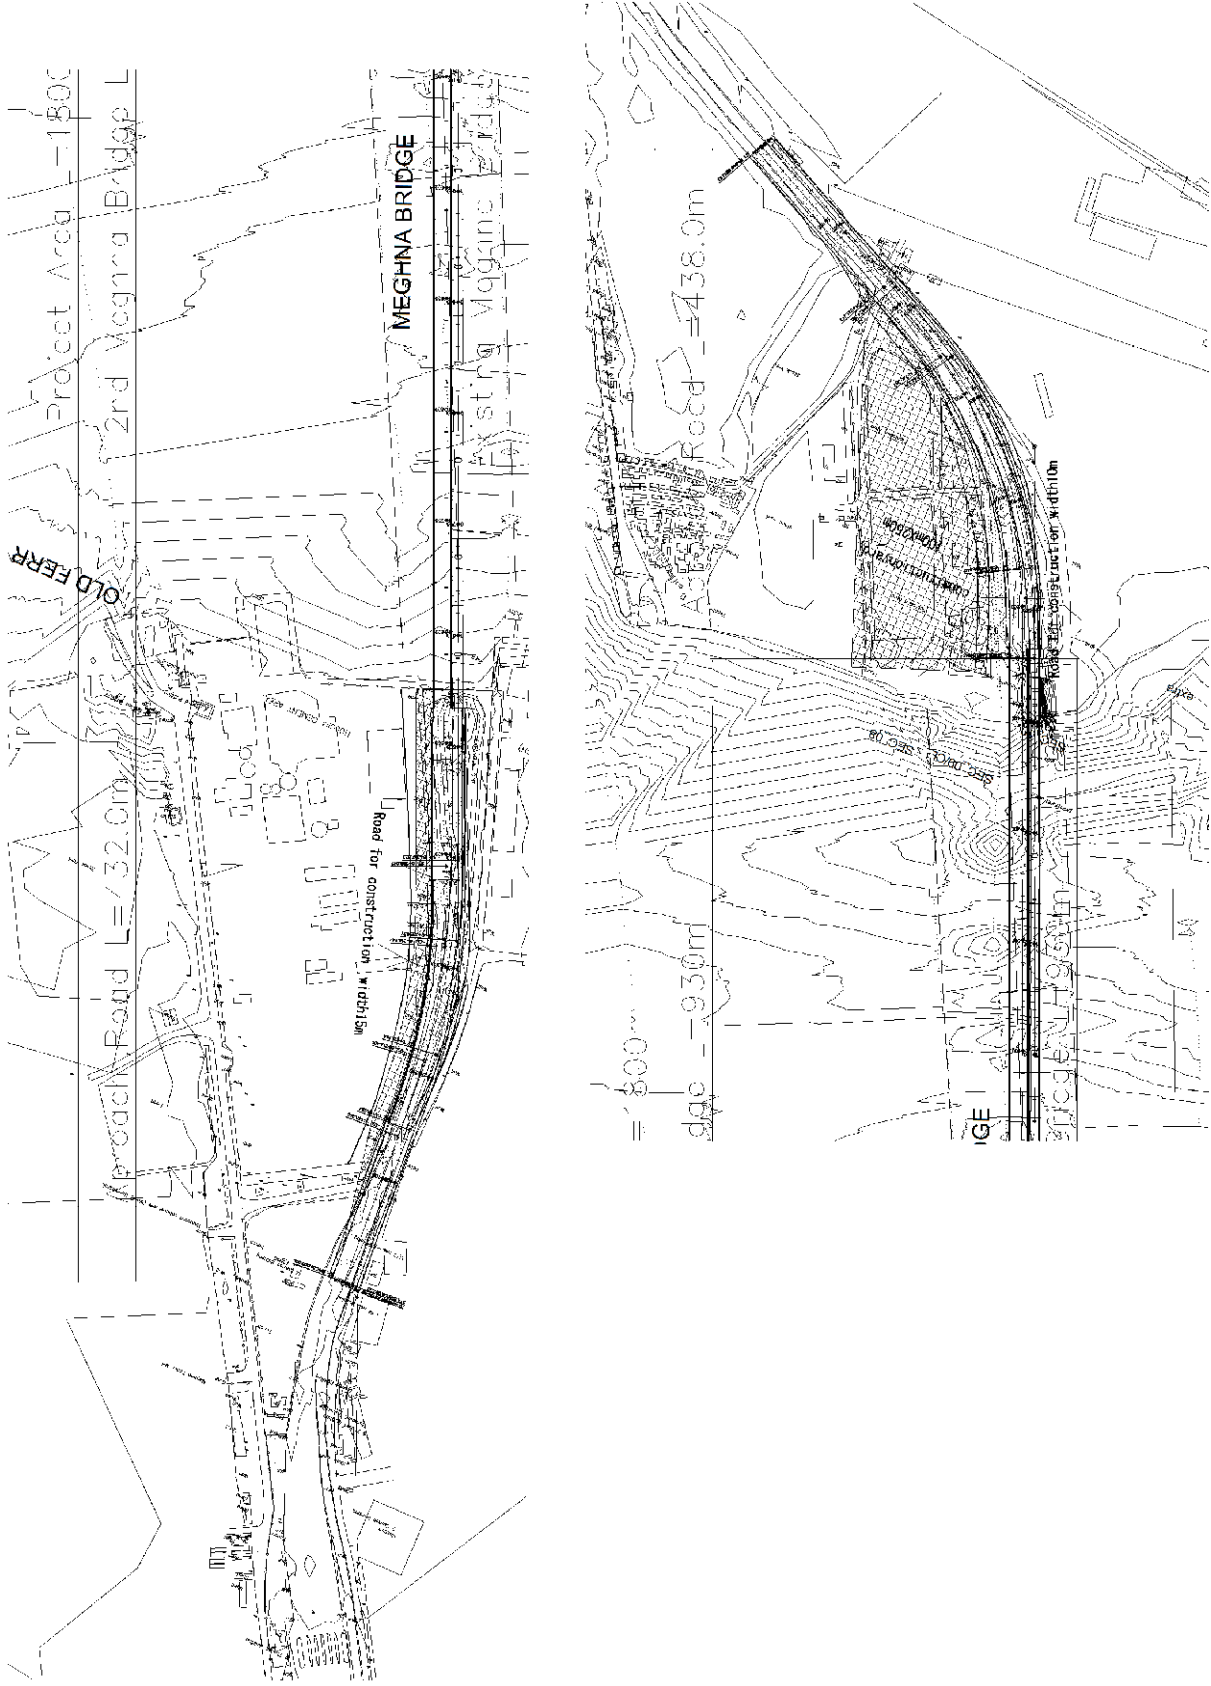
Construction Yard and Temporary Road at the Meghna Bridge Site
